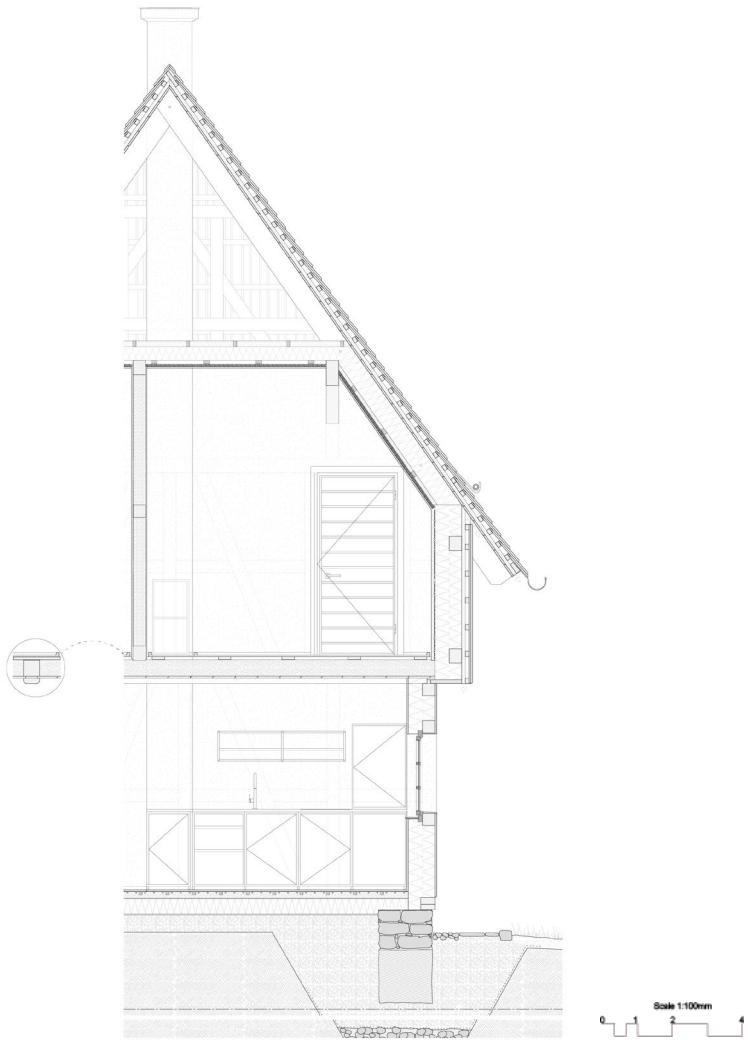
Cross section, timber frame + assembly - Scale 1:100 (Author's drawing)
